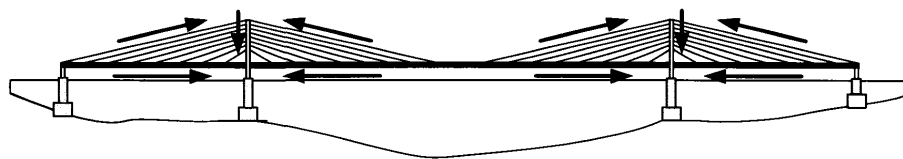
Cable force transfer mechanism for a cable-stayed bridge
